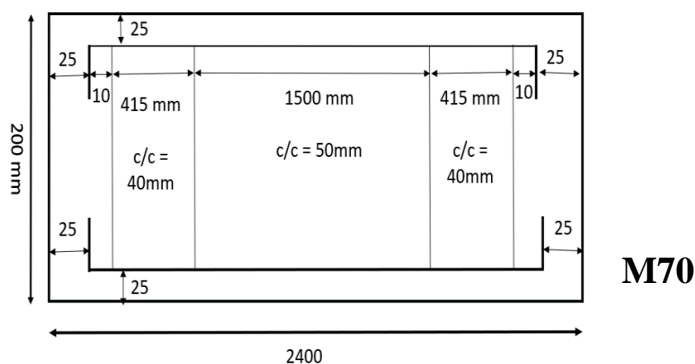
(c) Design details for M40 and M70 reinforced beam (Lateral View)
